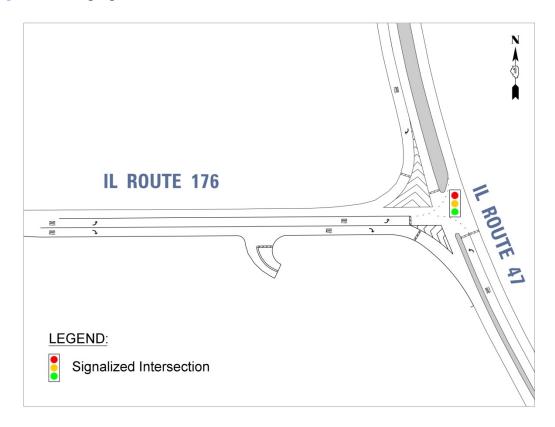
IL 47 at IL 176 - Existing Intersection
